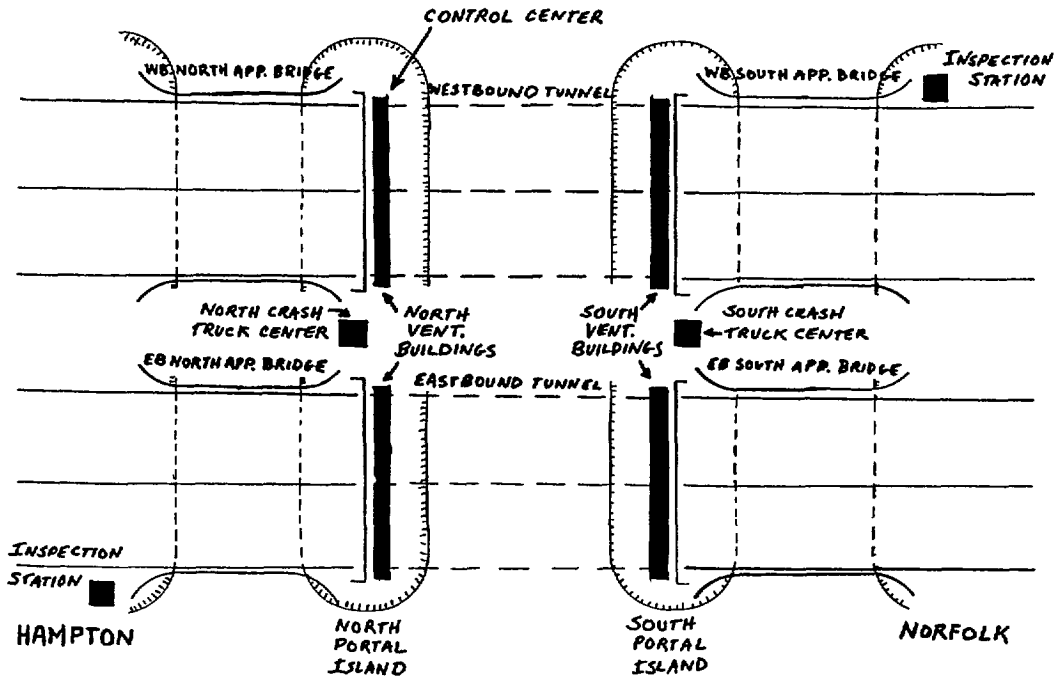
Hampton Roads Bridge-Tunnel Facility.
